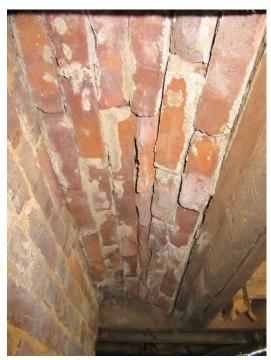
Masonry infill at underside of hearth in the guest bedroom.
